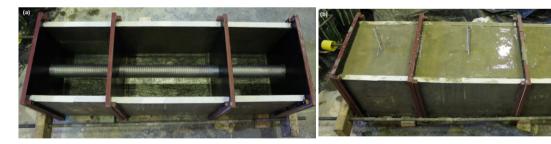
Concrete blocks casting assembly and vertical holes printed on top of the concrete blocks for grout injection.
